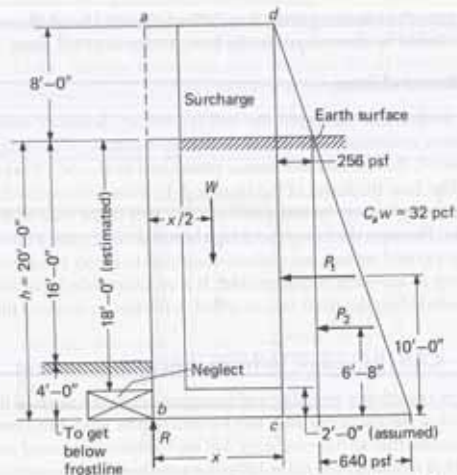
Preliminary proportioning for cantilever wall in design example.
